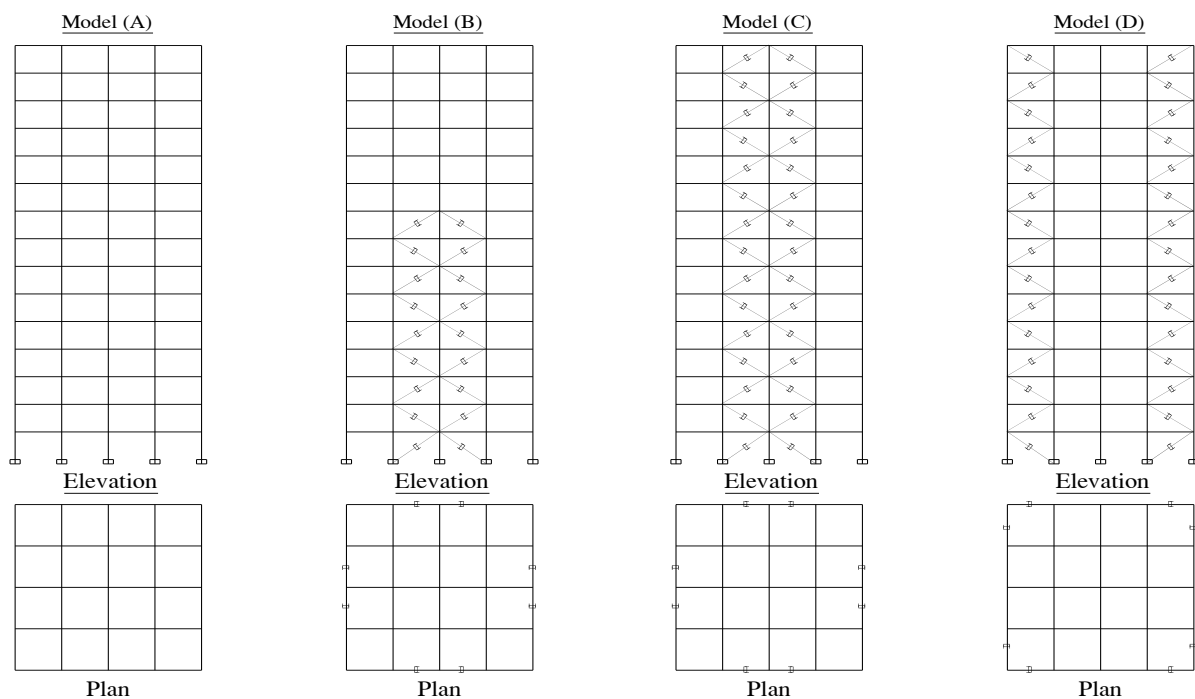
Multi-story buildings are symmetrical without and with FVD
